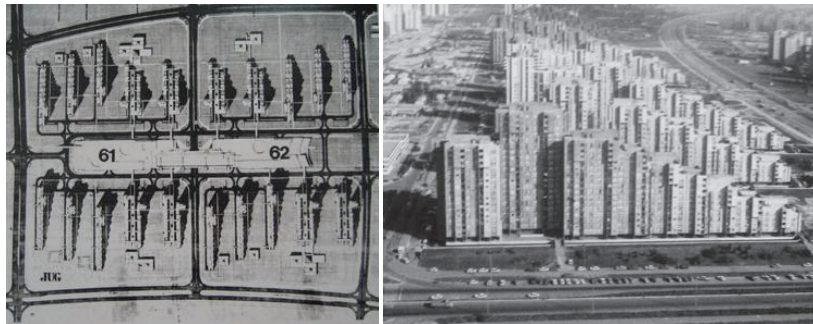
The initially planned structures along the Boulevard of Jurija Gagarina: (left) blocks 61 and 62 – plan, (right) typical block.
